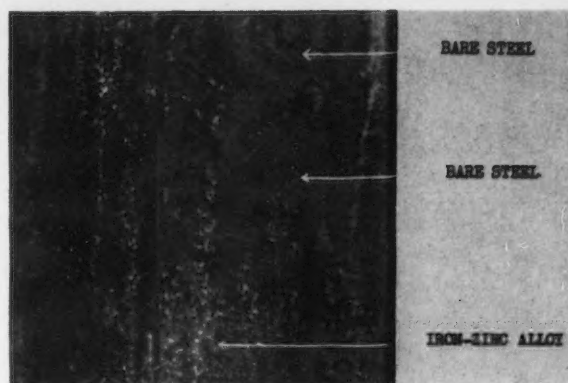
Portion of a tower leg from six feet below ground. Potential was 0.786 volt after disconnection from ground.
